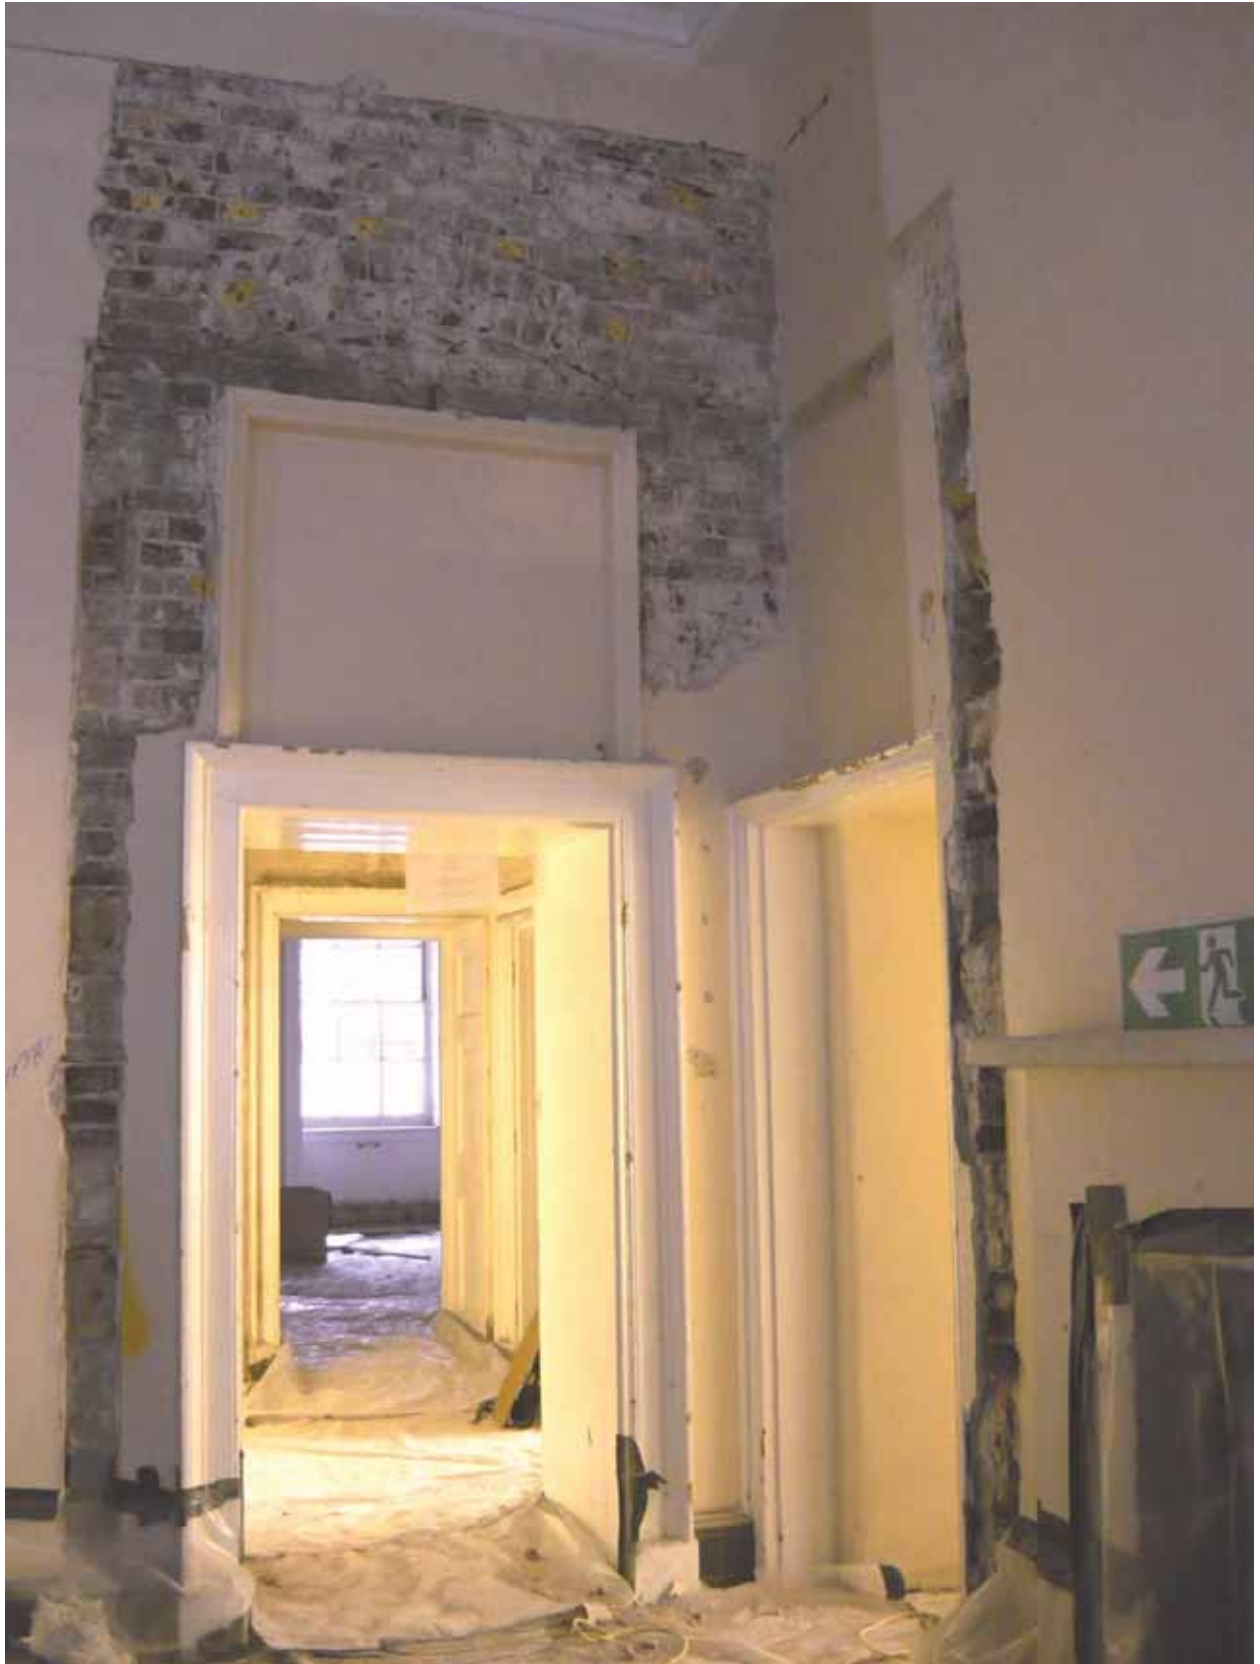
West (left) and north (right) walls in Room M29a, looking west (EAF10 BHD6 (95))
